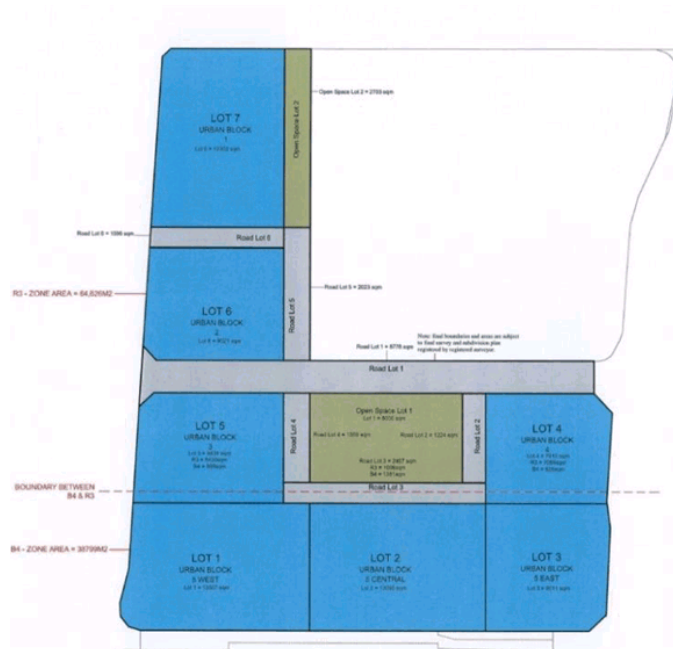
Approved Master plan concept subdivision plan DA-14/96
